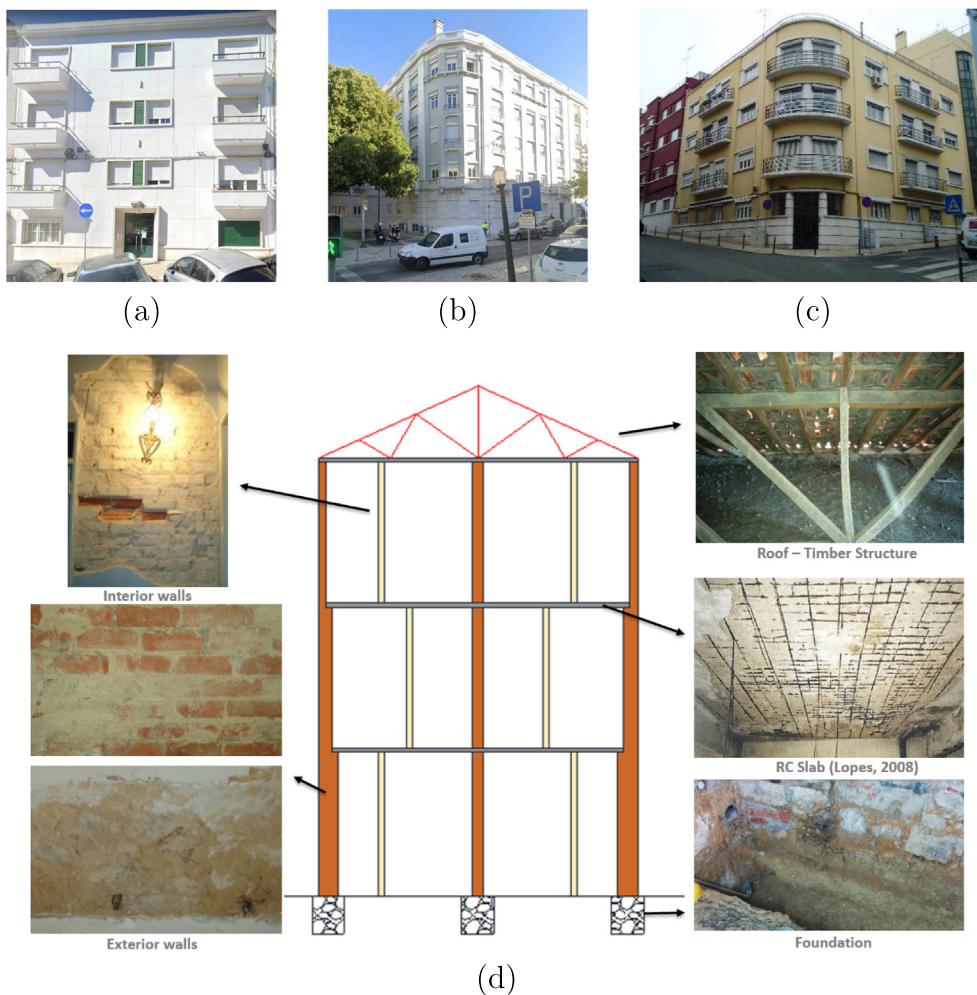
(a)-(c) Examples of Placa buildings, (d) Scheme of Placa building typology with various types of masonry walls.
